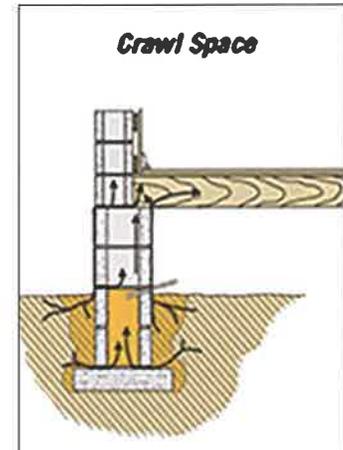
Crawl space foundation. Termiticide (shown in yellow) needs to be applied where termites enter and contact foundation elements.
